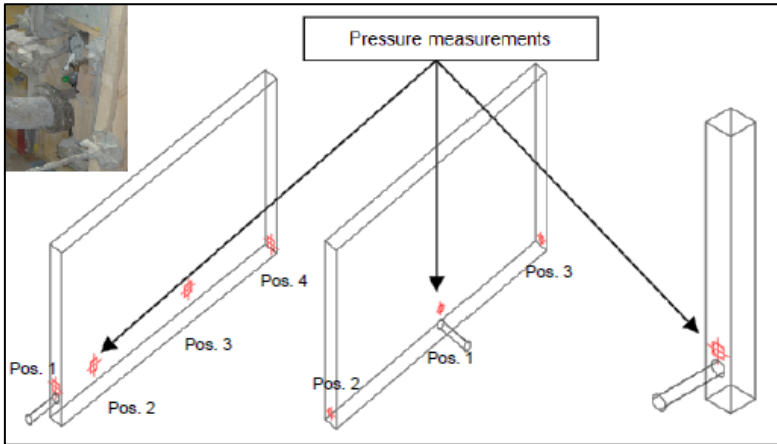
Connections of the SCC inlet for the walls and for the columns.
